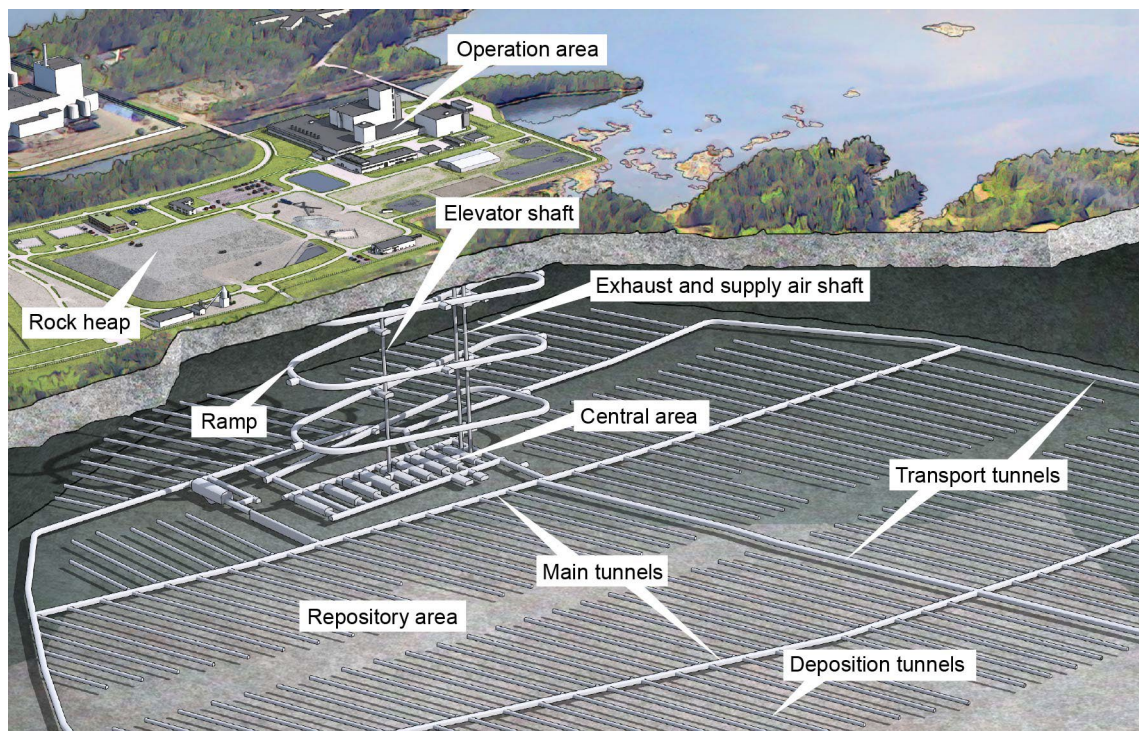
Southern view showing SFK's above-ground and underground facilities, including the central area, repository area, and the ramp and shafts connecting the underground section with the surface facilities.
